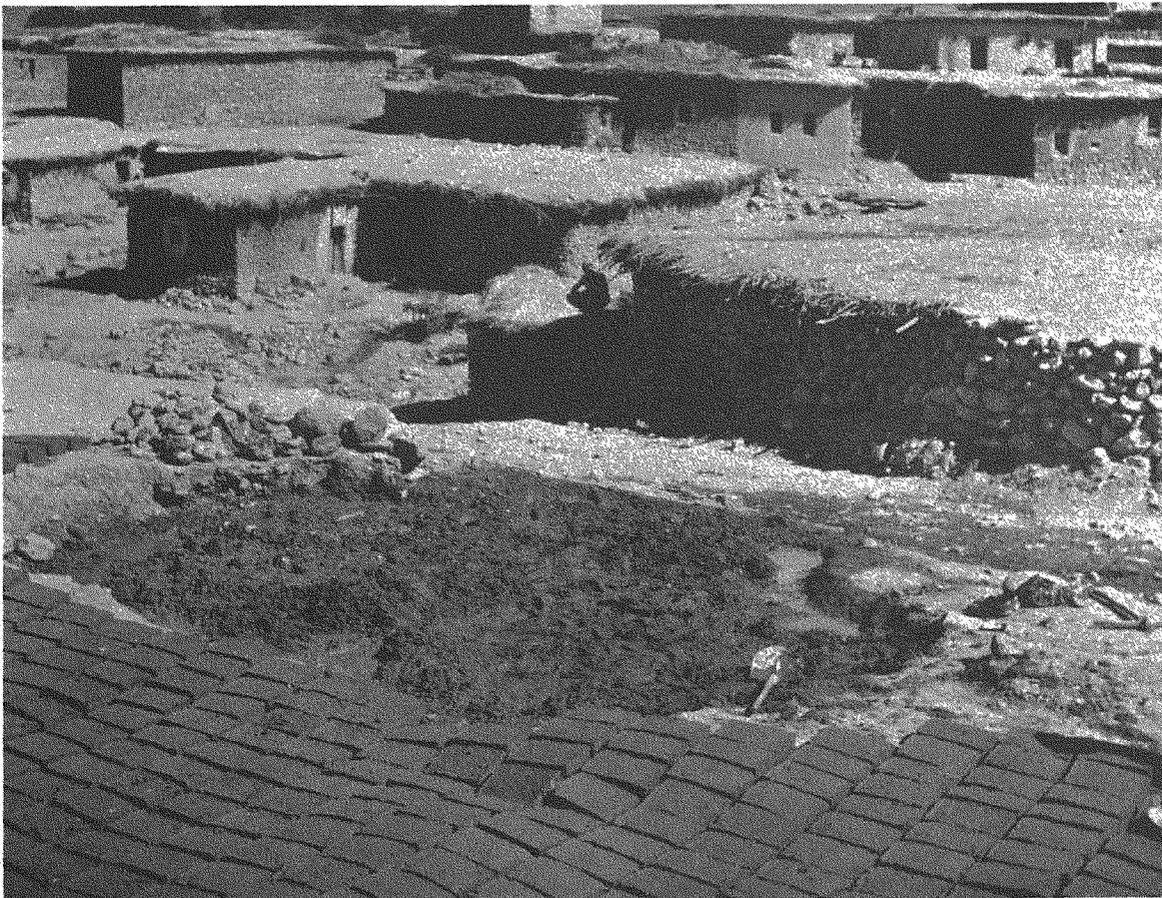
Housebuilding. Clay and water are kneaded with the feet. Pebbles for foundation are transported by donkey. Topzawa.
